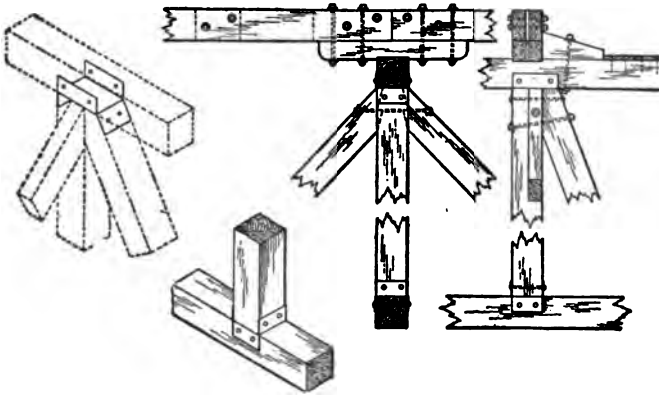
Wrought-Iron Plates in Trestle Construction.
